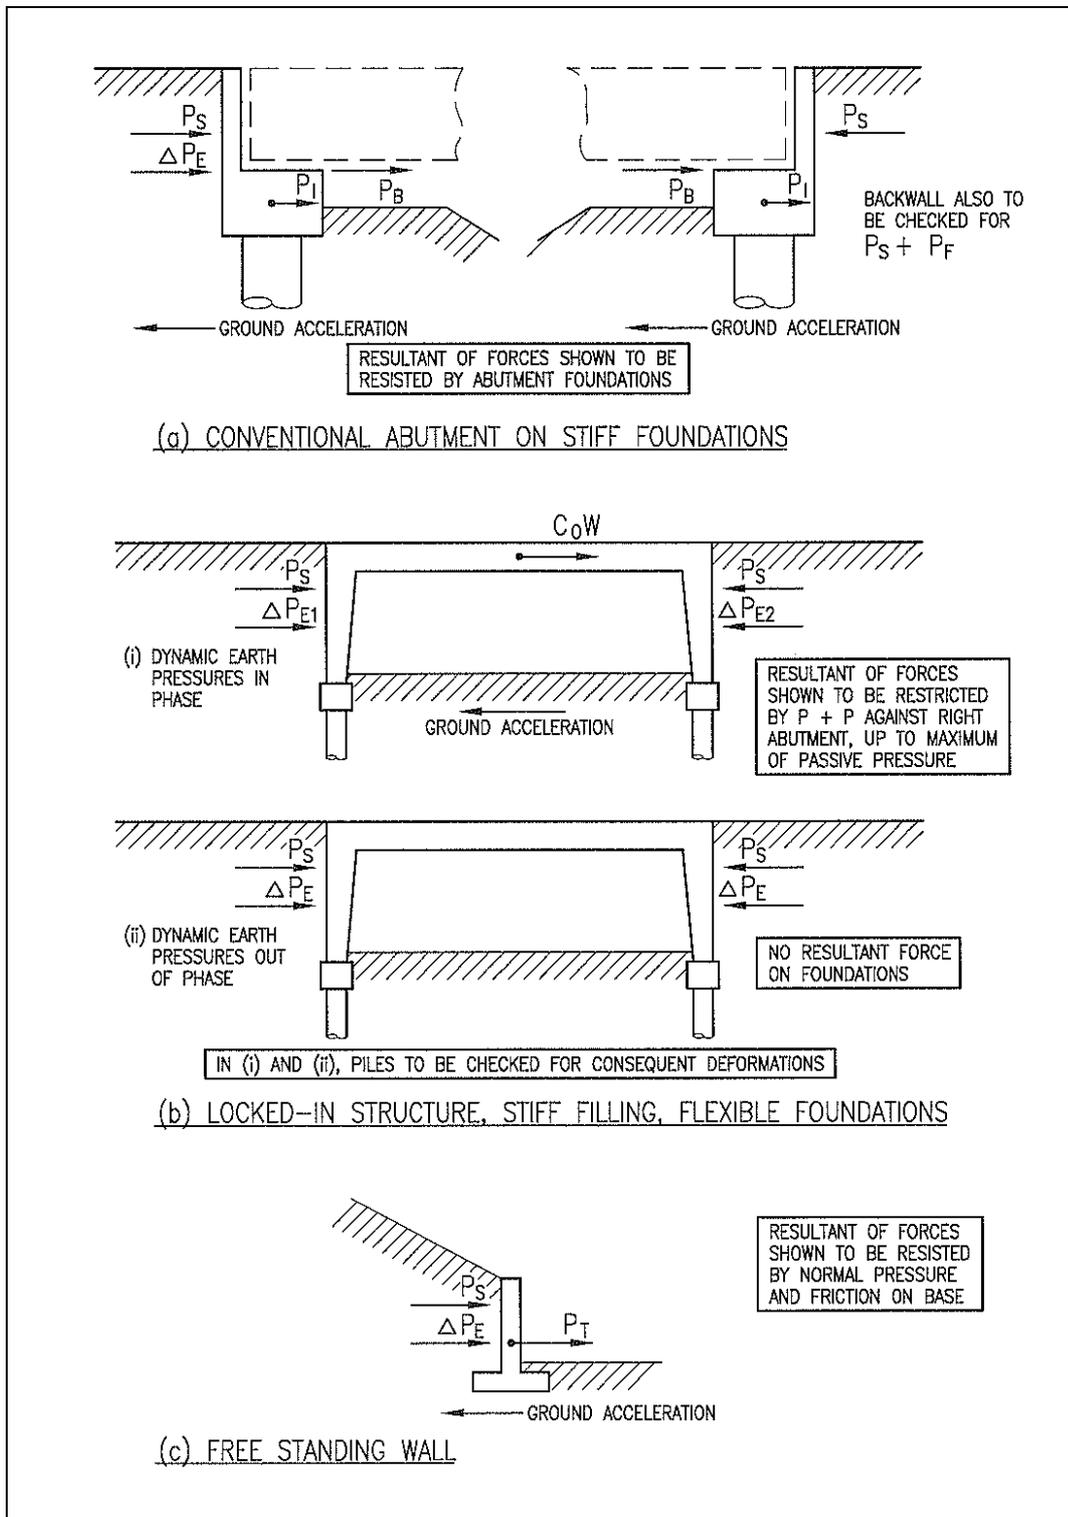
Seismic Force Combinations on Abutments and Retaining Walls
